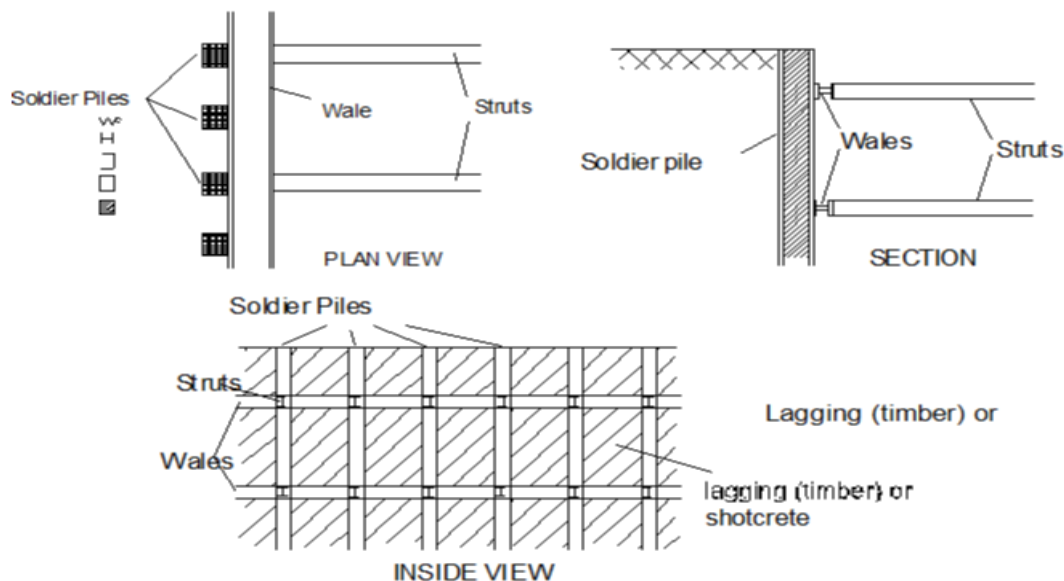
Braced Walls; Plan, Section and Inside Views (Ergun, 2008)
